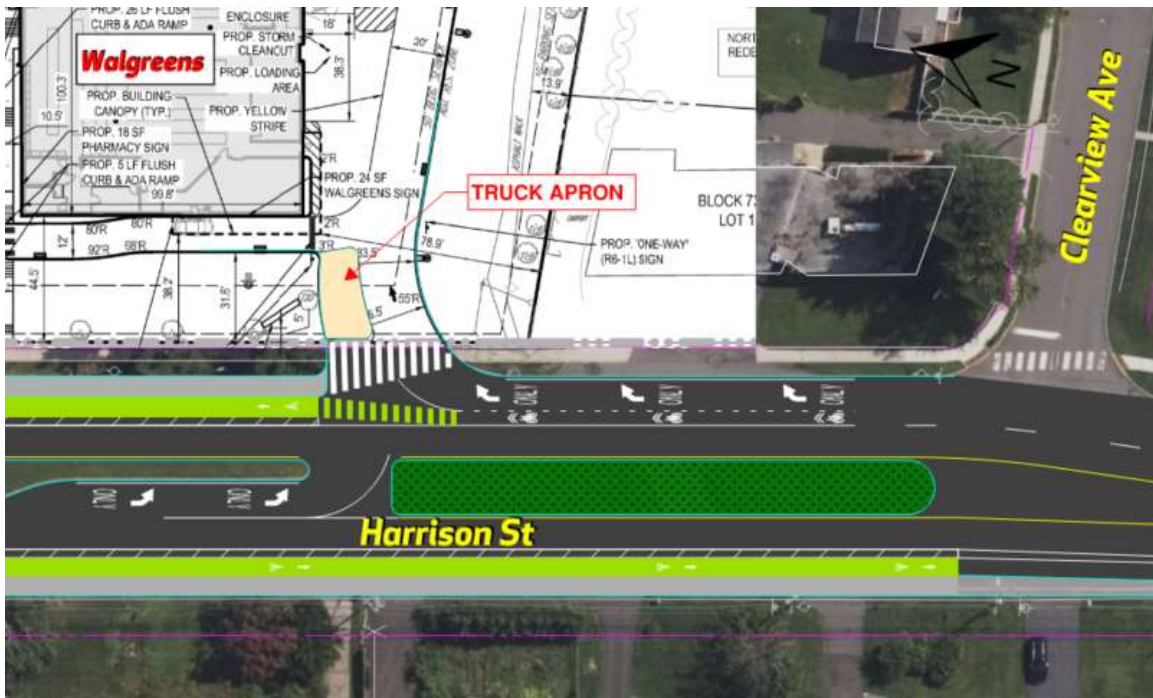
Truck Apron design at future Walgreens driveway. Note that the accompanying bicycle facility may be on-street (as shown) or raised, per the preferred recommendation.
